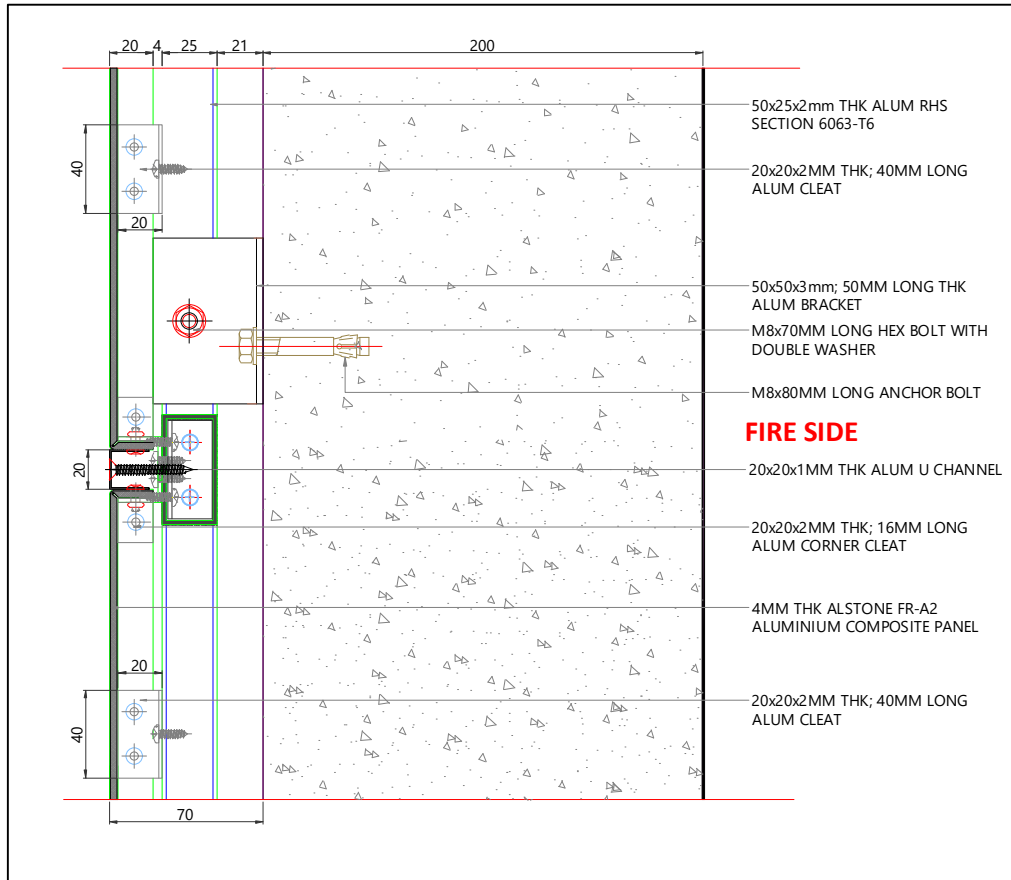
Elevation of the wall bracket layout along with plan and sectional view.
